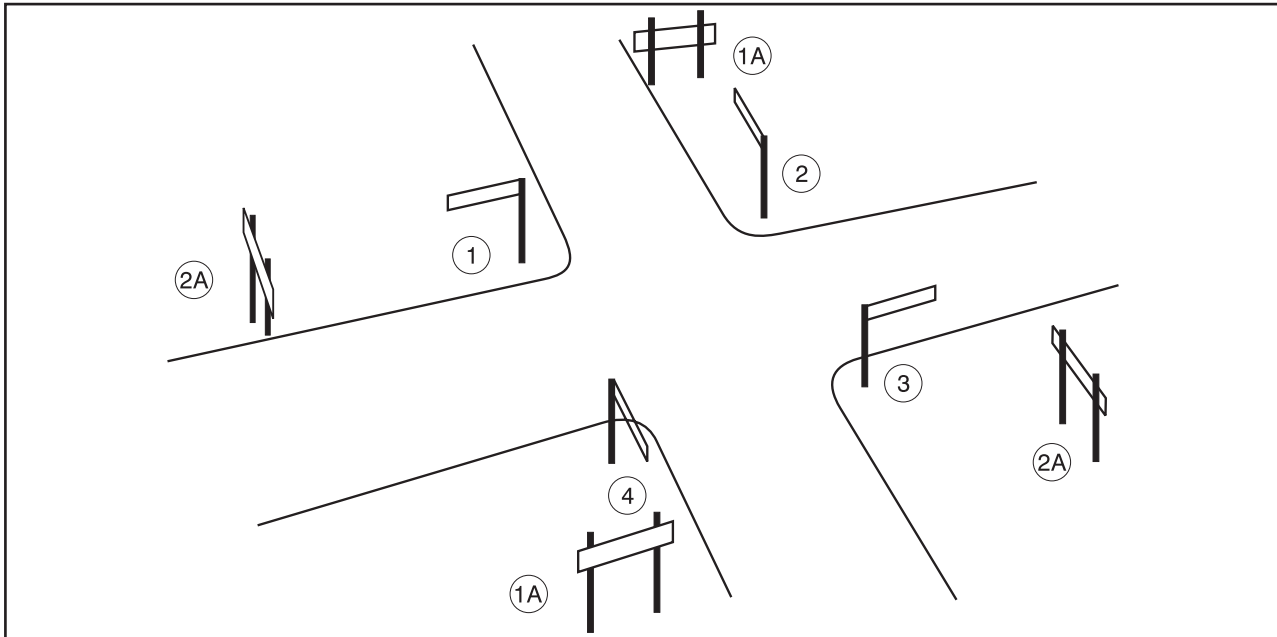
INTERSECTION OF UNDIVIDED MAJOR STREET
